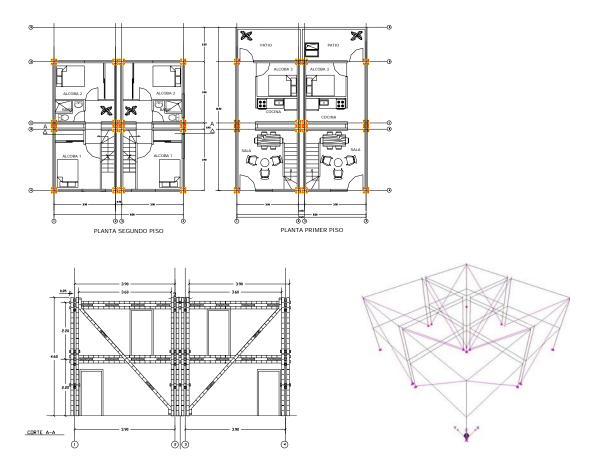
Distribution plants of first floor, second floor of the house. Drawing of the model 3.
